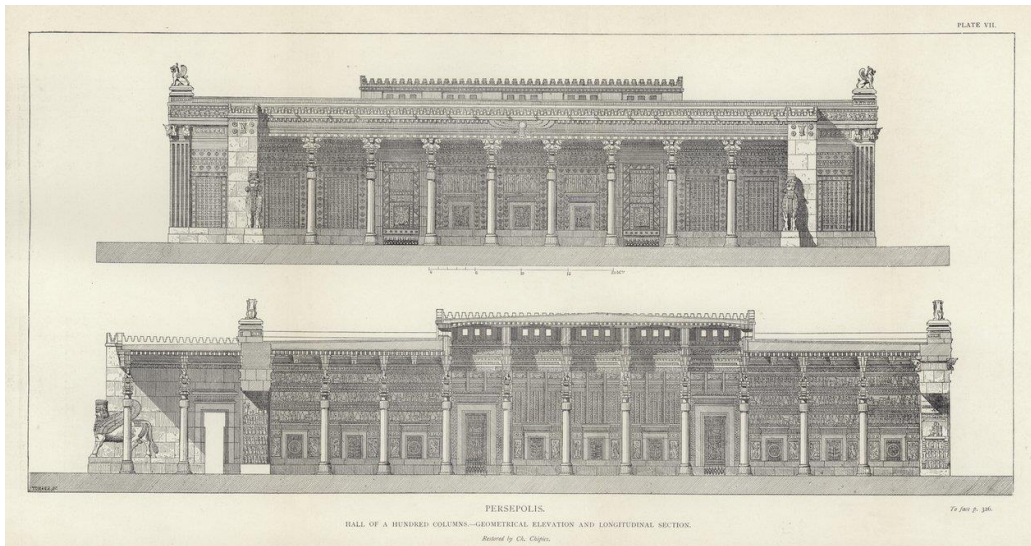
Ch Chipiez reconstructed the Hall of a Hundred Columns at Persepolis, featuring a geometric elevation and a longitudinal section
